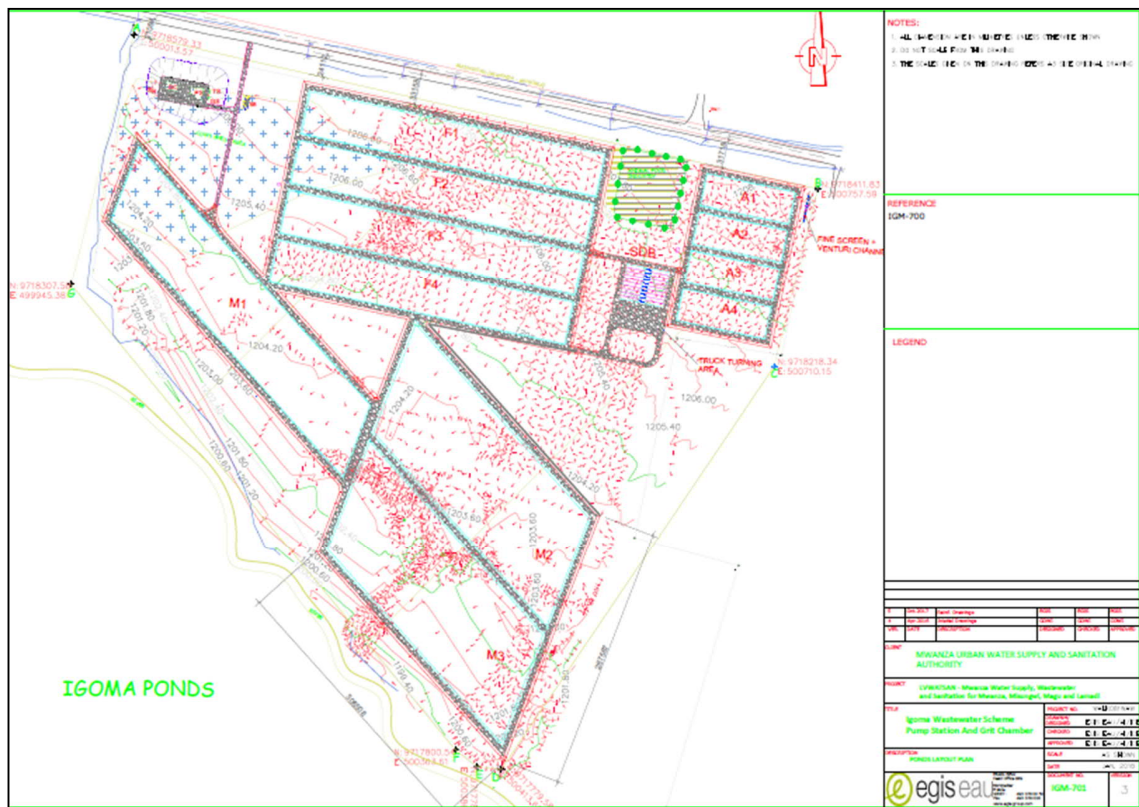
Proposed lay-out of Wastewater Treatment Plant
